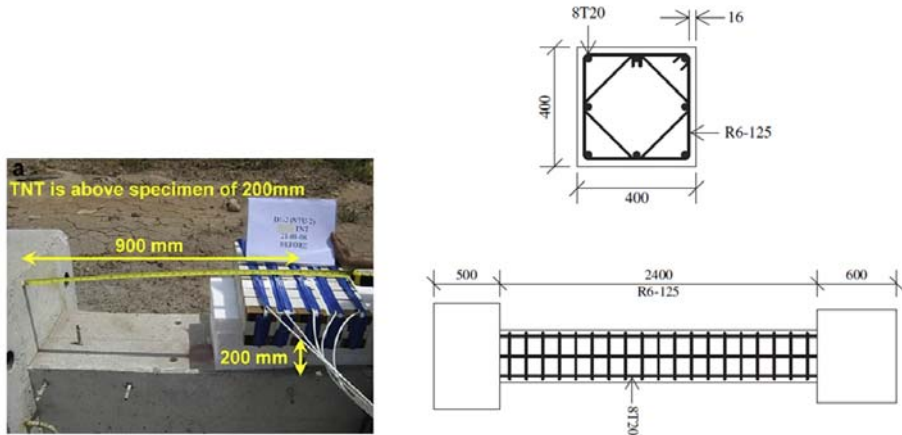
Geometry and section details of RC column specimen and test setup configuration [6].
